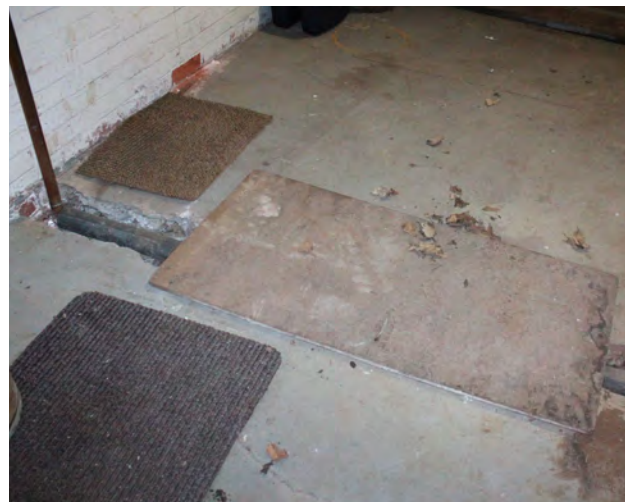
Part of basement concrete floor was cut-out to install piping. (HA, 2015)
